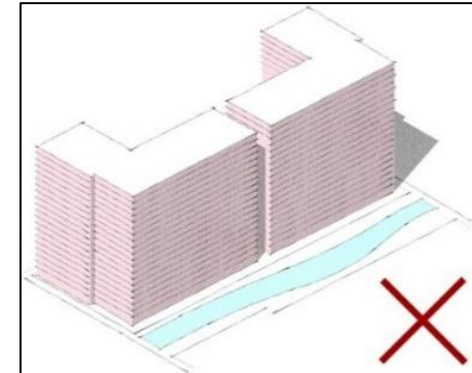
Illustration represents poor building Massing with high-rise façades set close to the canal and street, with the potential to cast long shadows on public open spaces.
